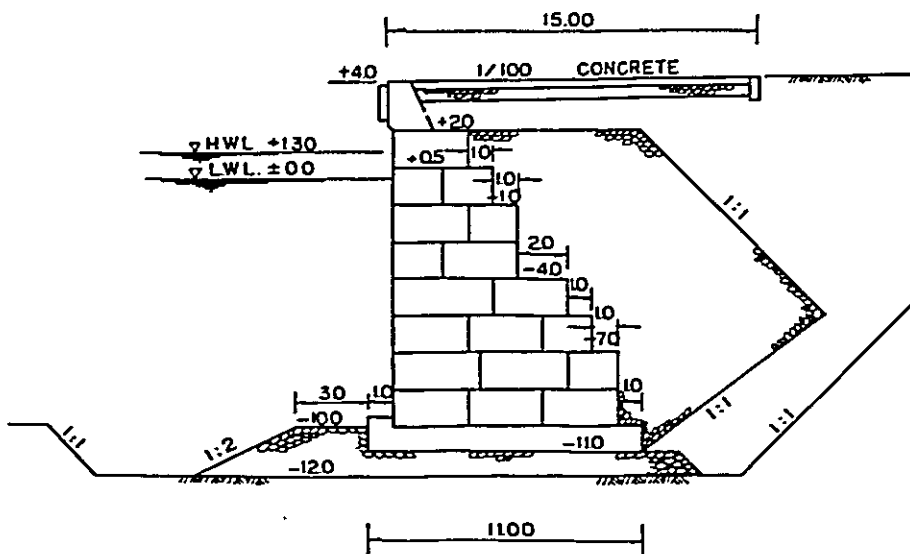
TENTERTIVE DESIGN OF -10^M QUAY WALL
